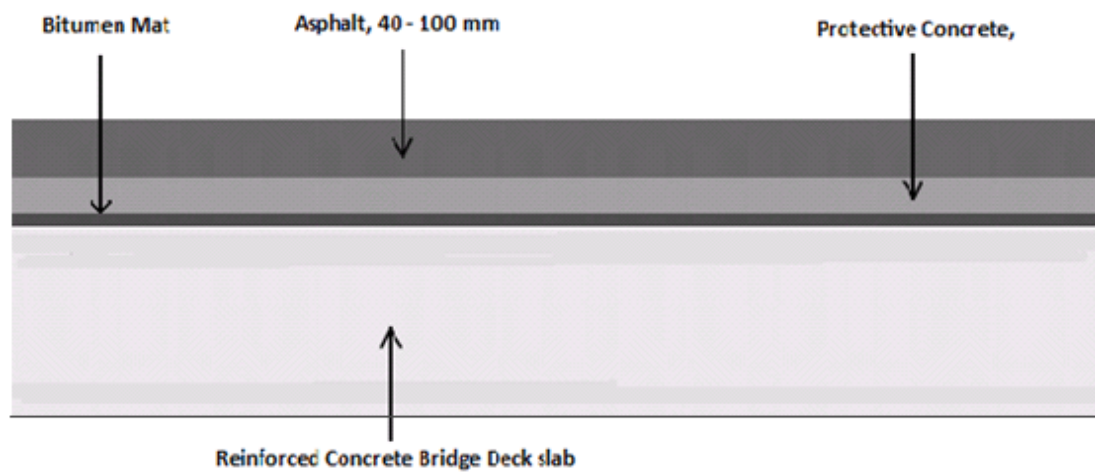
(b) Example of composition of a bridge deck slab with protective concrete and pavement (Adapted from Paulsson 1999).
